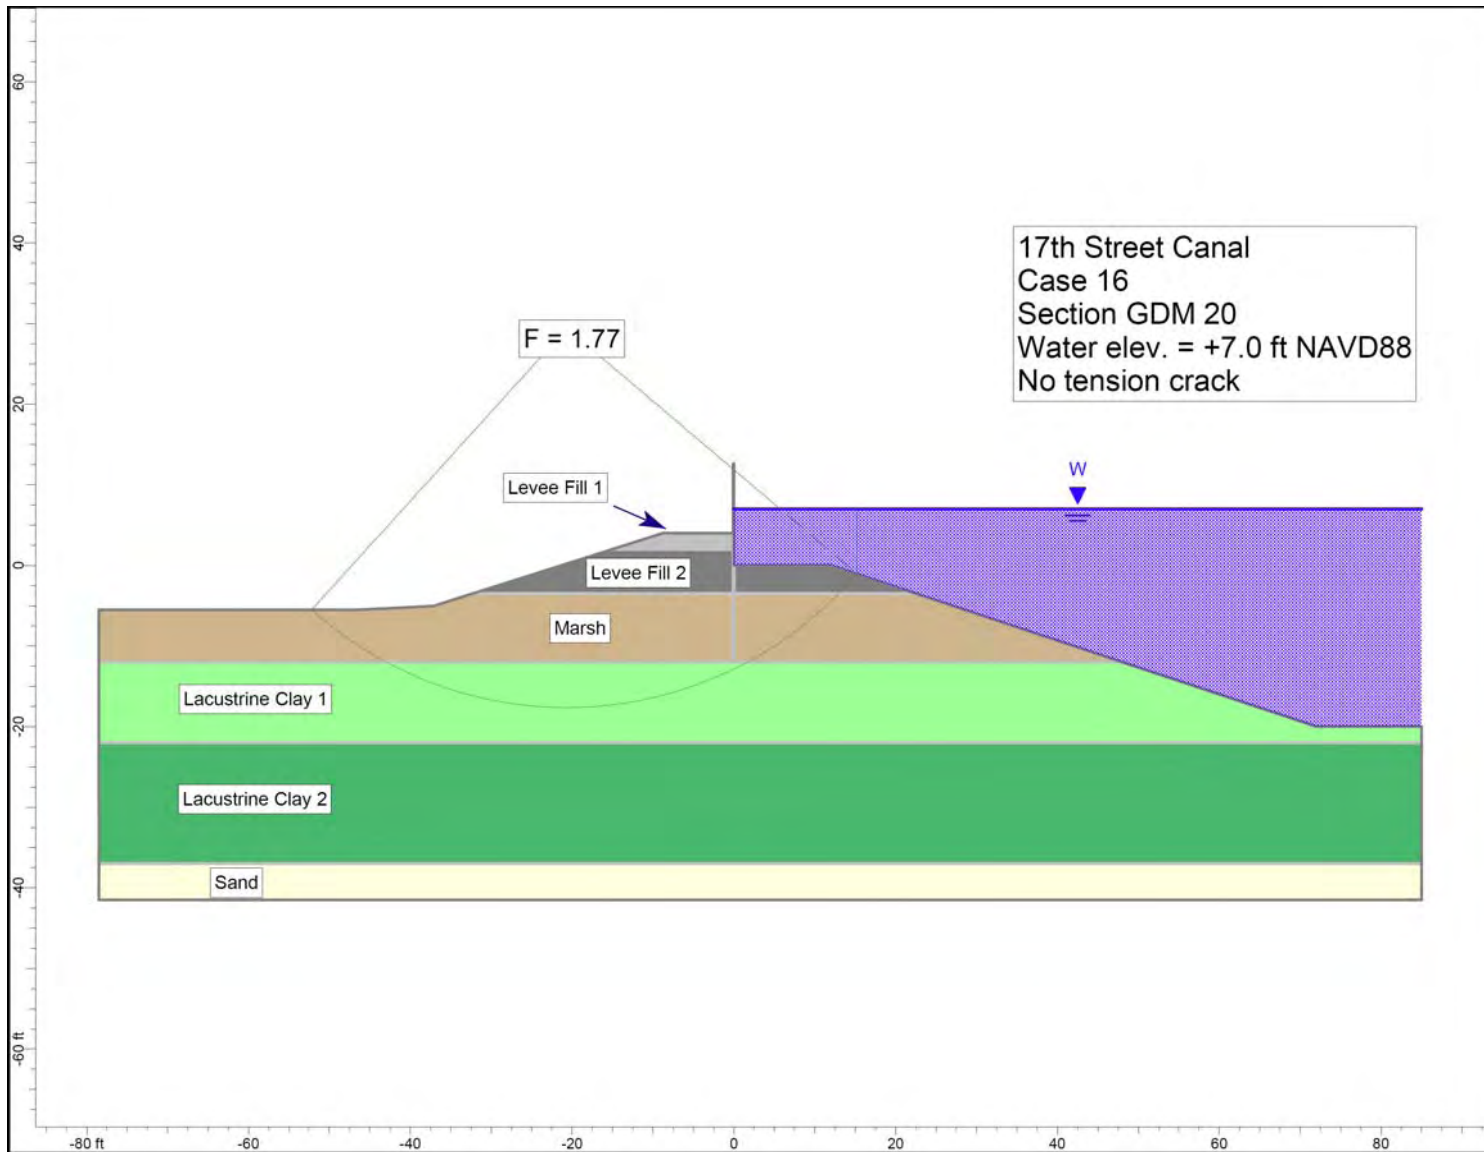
Critical Circle for 17th Street Canal Design Cross Section – Water Elevation 7 ft, No Tension Crack
